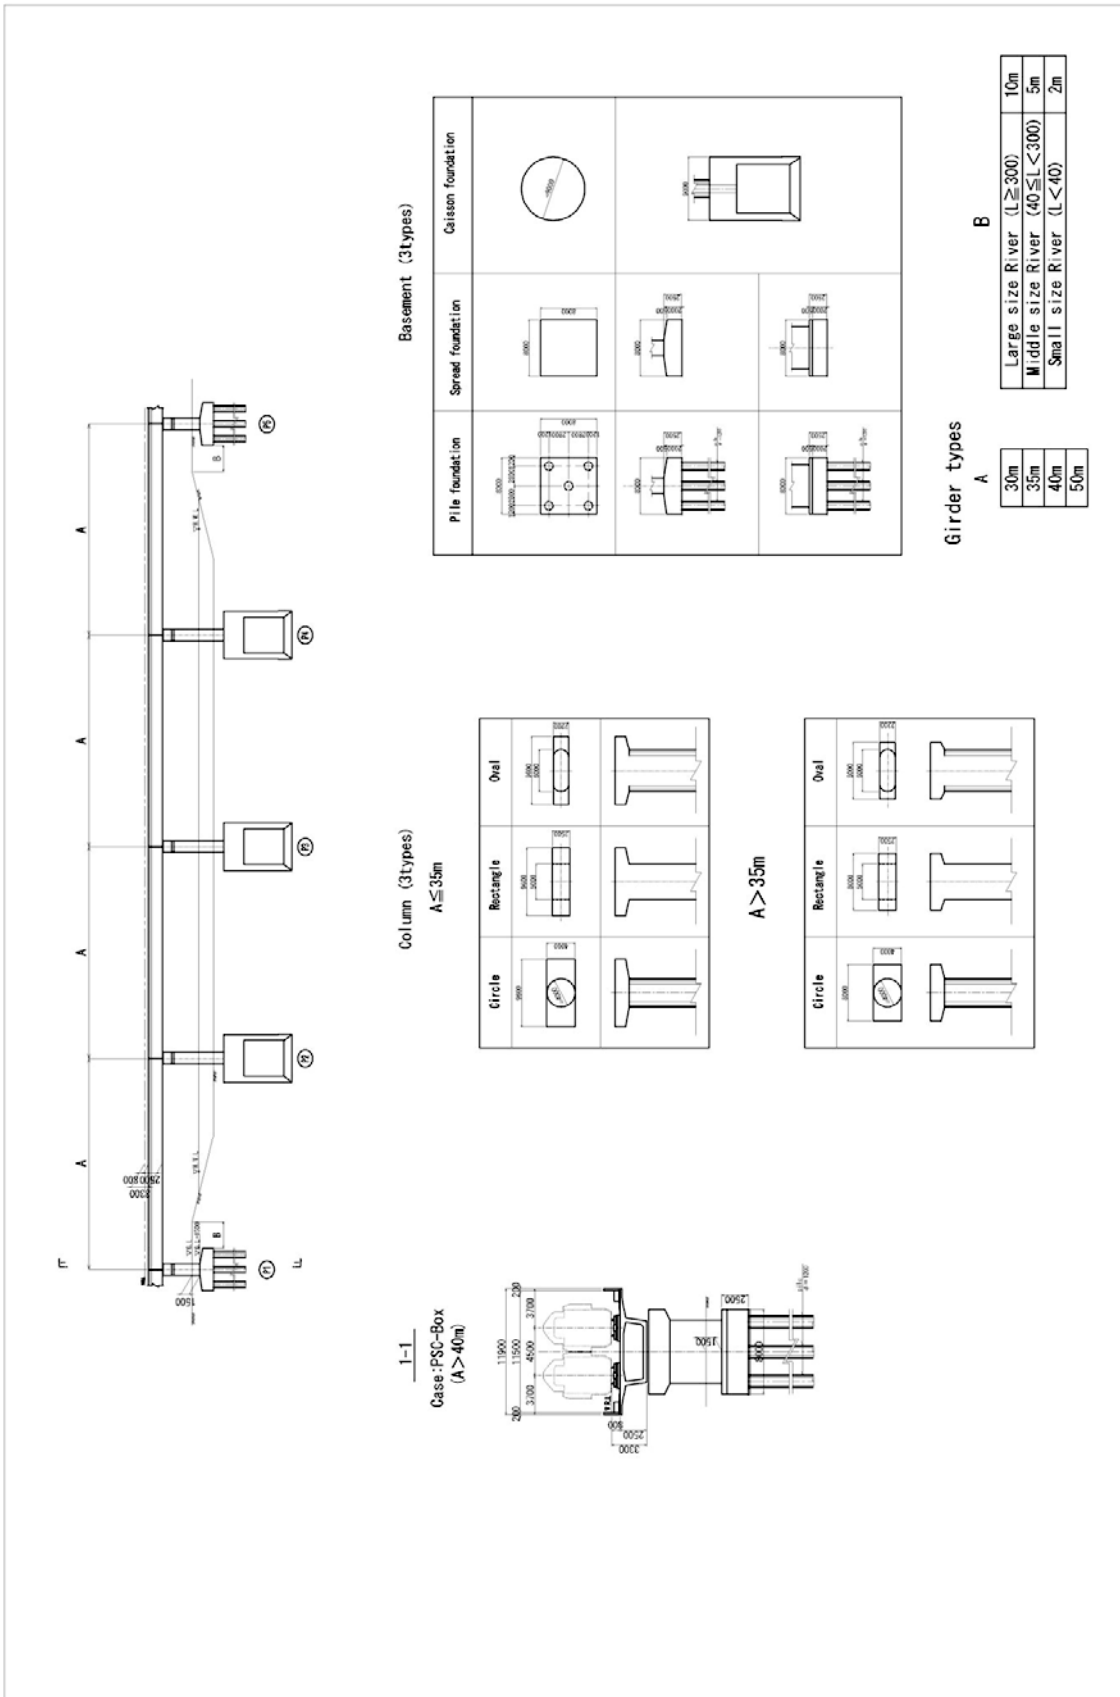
Drawing of Standard Structure Type for Bridge, Simple-girder, Multi-span
